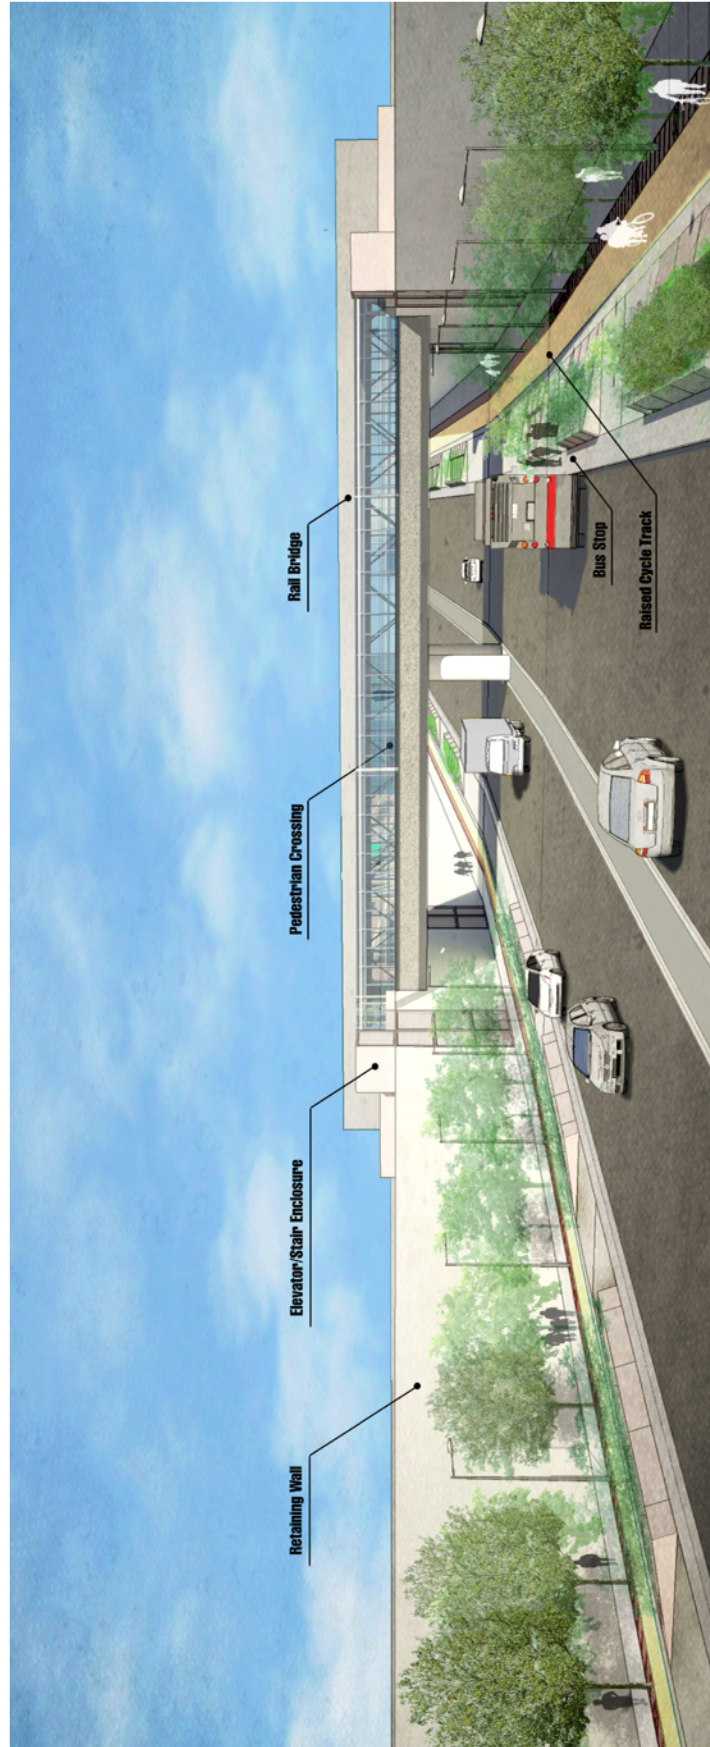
Preferred Design for Steeles Avenue East Rail Bridge
